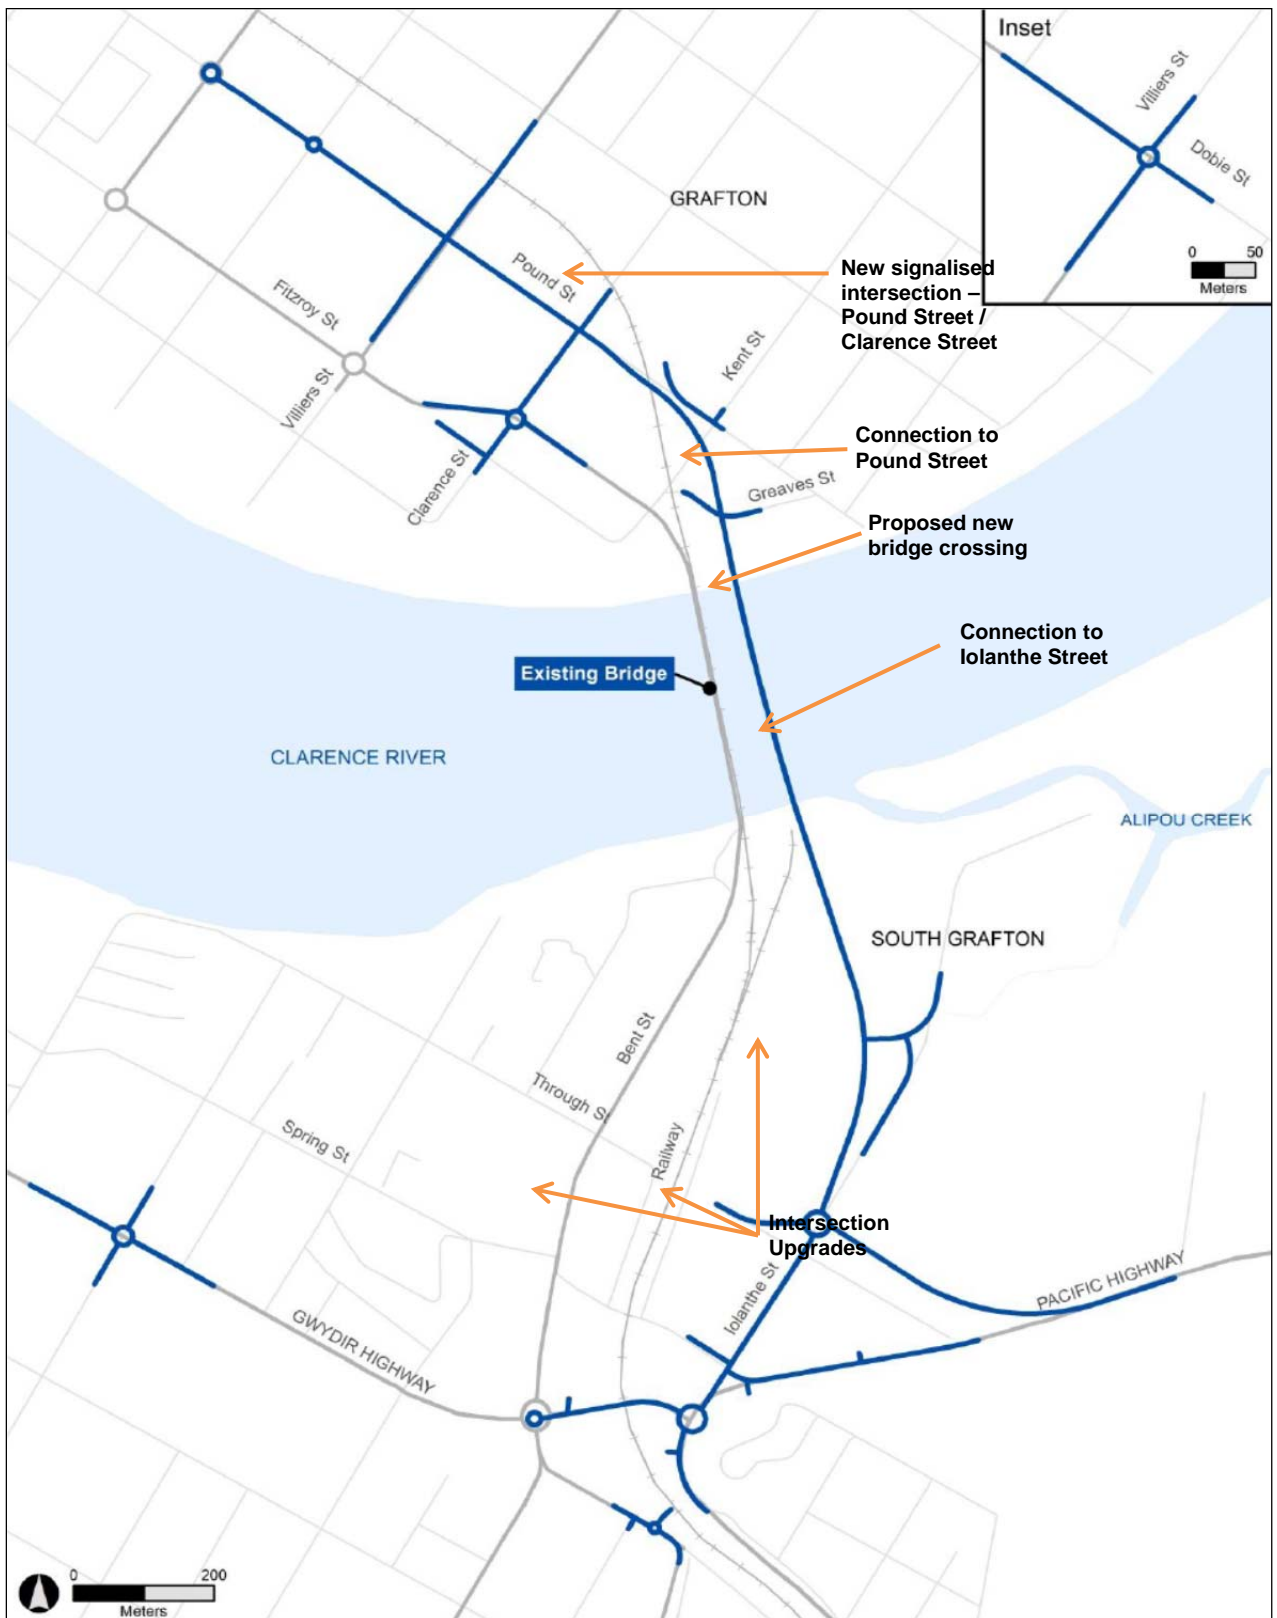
Proposed new crossing alignment and connections to the existing road network (RMS 2014)
